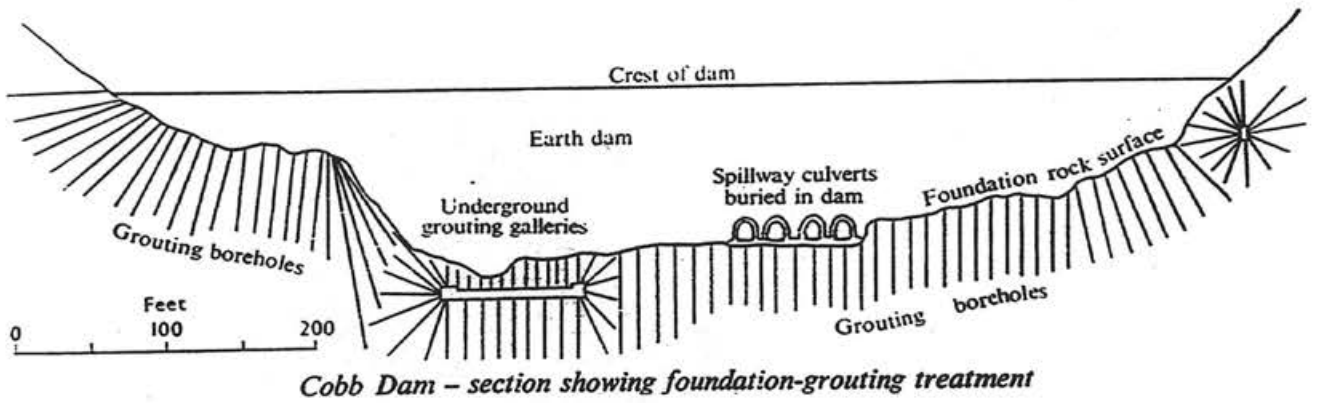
Cobb Dam - section showing foundation-grouting treatment
